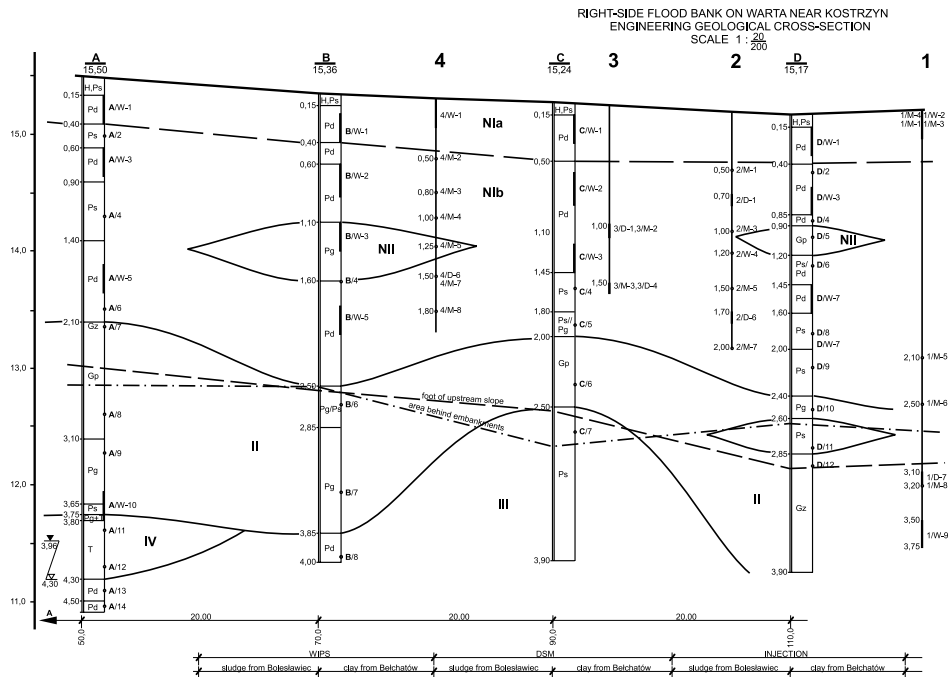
Engineering geological cross-section of the flood bank on Warta near Kostrzyn, on which the experimental section of hydraulic cut-off wall was constructed with use of vibration-injection, DSM and low-pressure injection technologies
